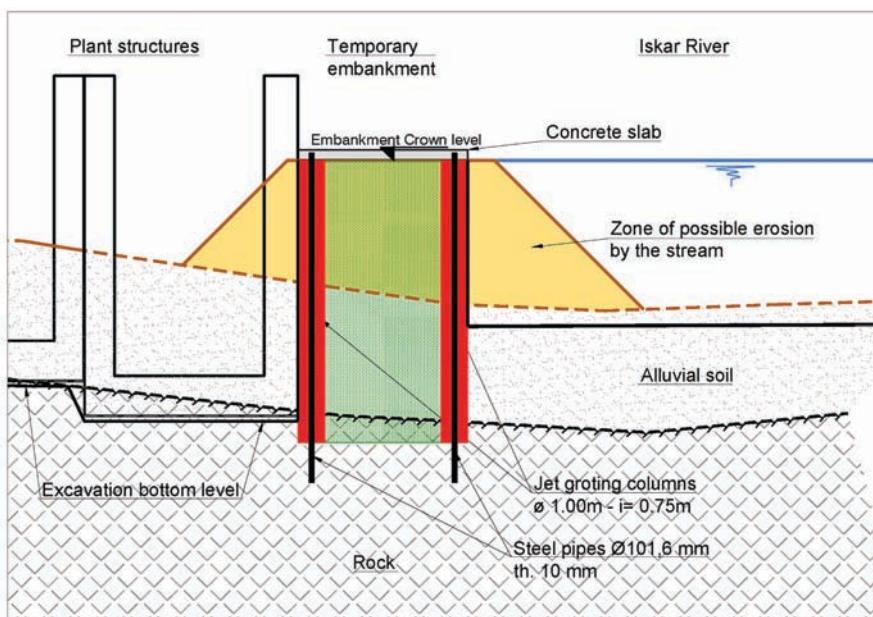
Cofferdam reinforced with jet grouting columns and steel pipes.
